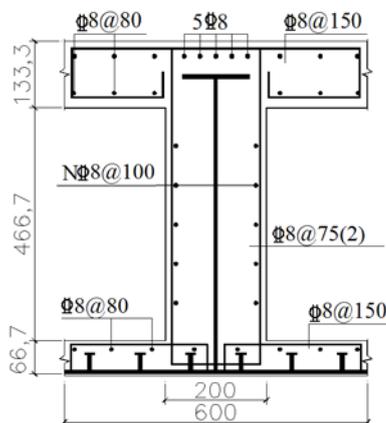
Section size of half-steel-concrete composite beam (Unit:mm).
